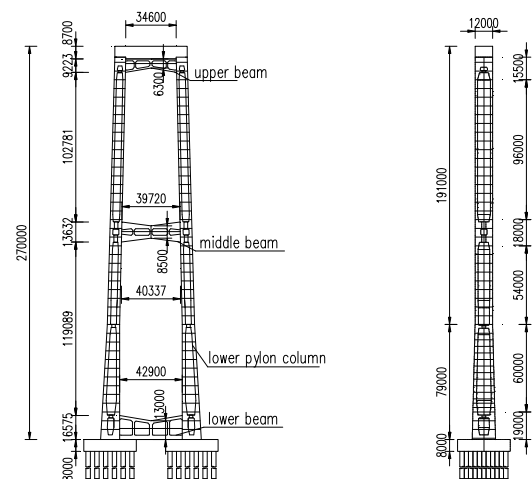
The structure of the east cable tower on Lingdingyang Bridge
